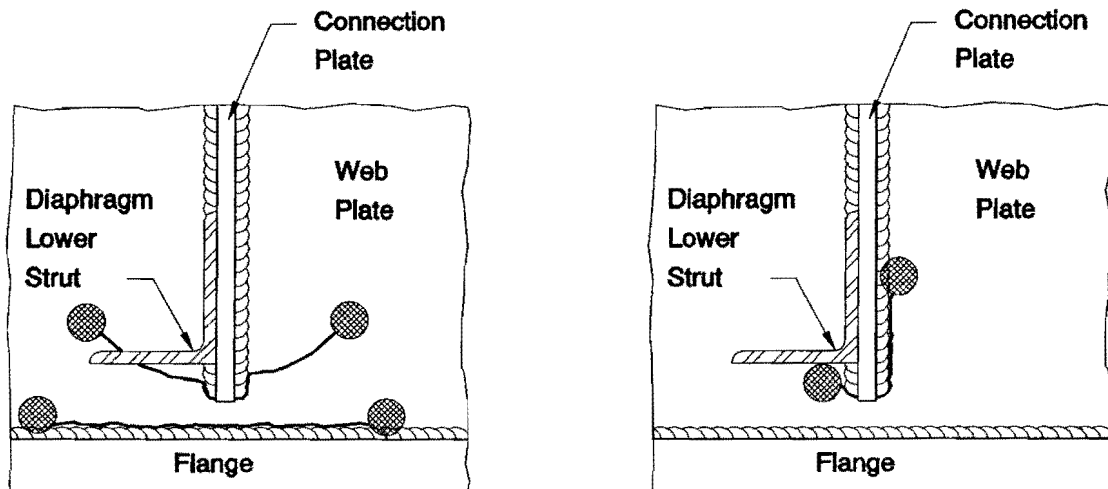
Typical drilled hole pattern for web gap cracking.
